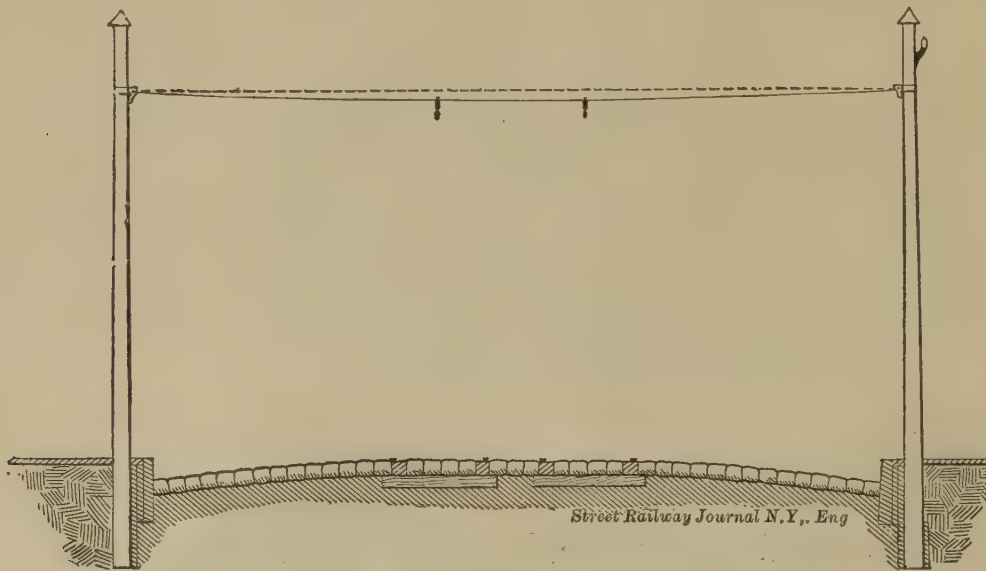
SECTION OF STREET SHOWING POLES AND SPAN WIRE.
